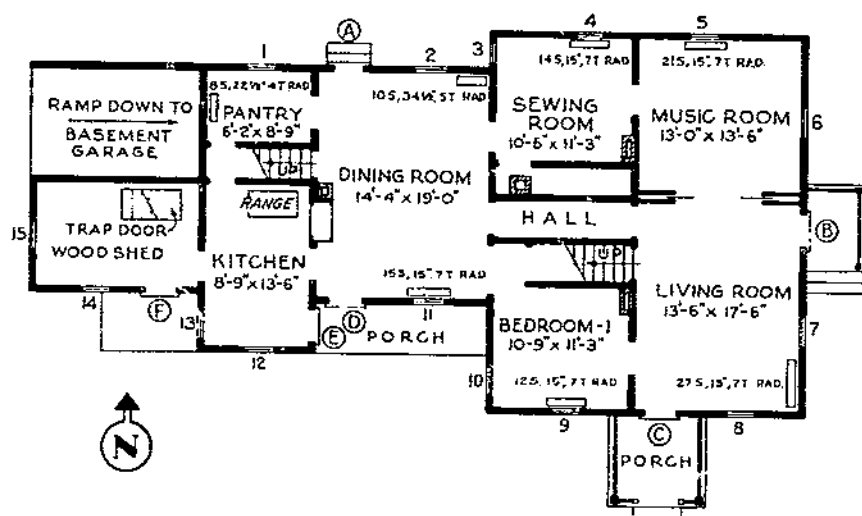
First-floor plan of house No. 8, showing the location of radiators.
